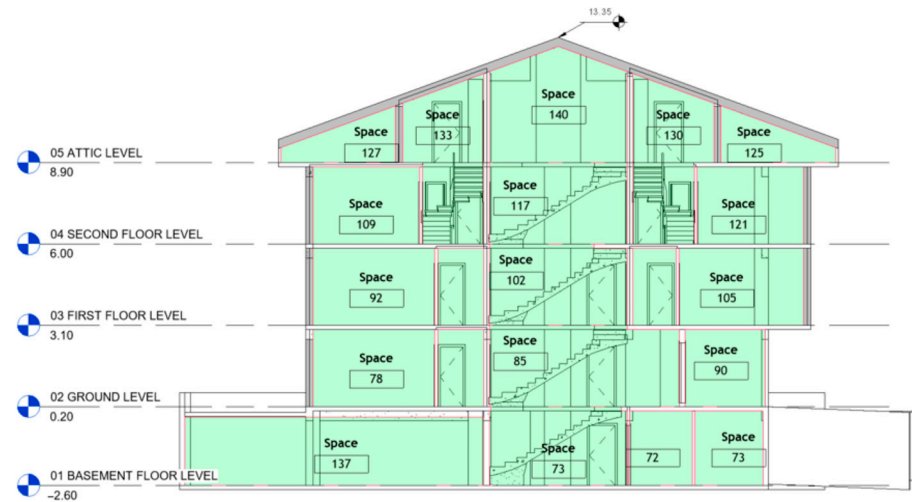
Section view of the building, illustrating the elevations of levels and spaces.
